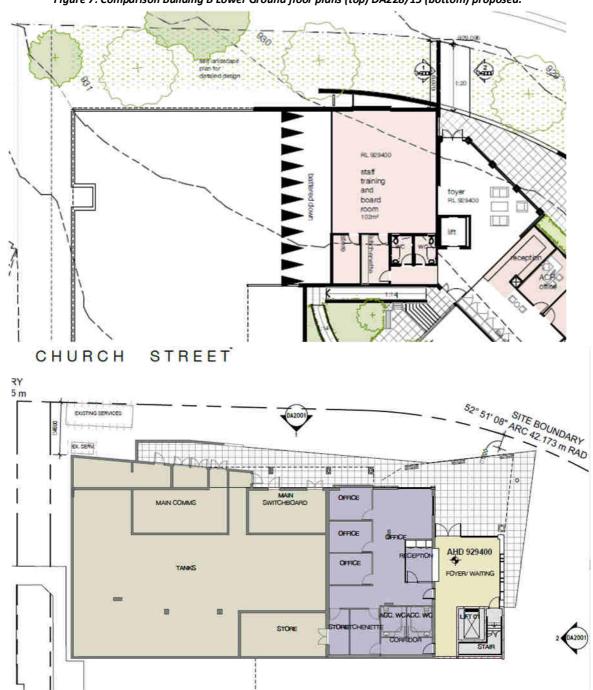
Comparison Building B Lower Ground floor plans (top) DA228/15 (bottom) proposed.
